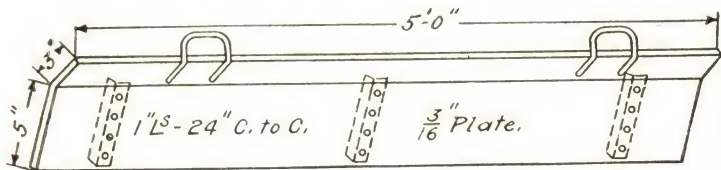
Steel Plate, an Aid in Placing Facing Material
